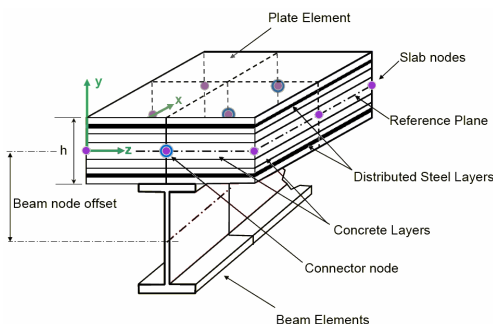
Schematic diagram for beam and layered slab elements in Vulcan.
